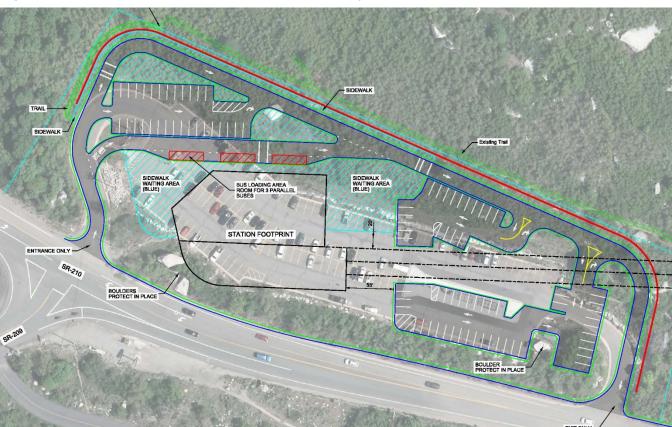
Gondola Alternative A – Base Station Layout
